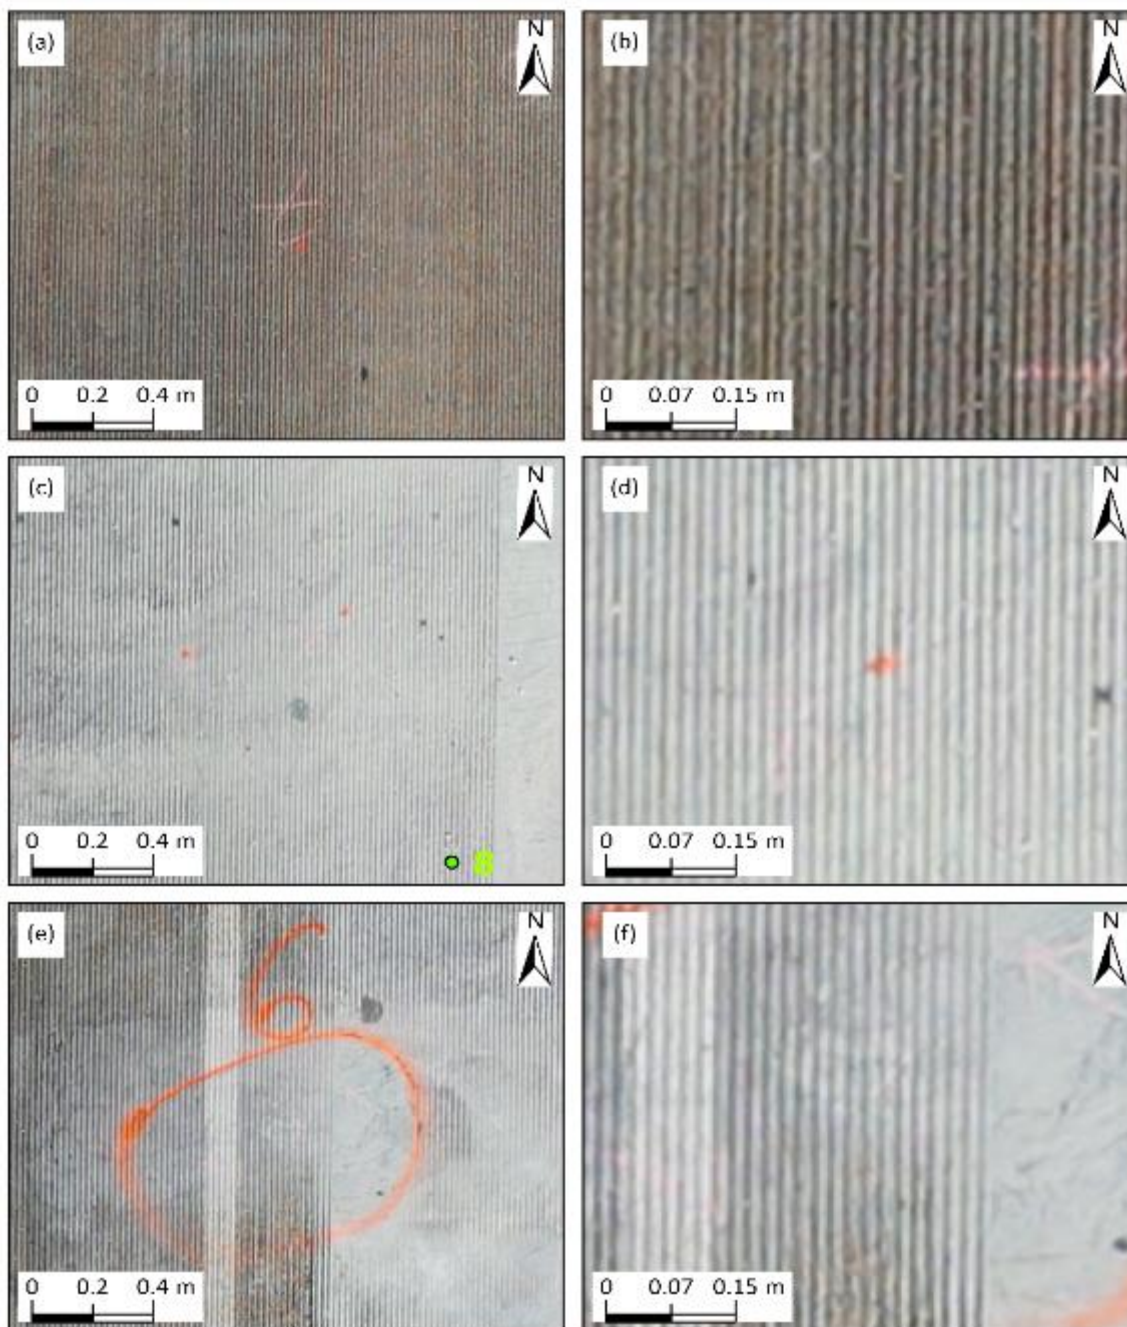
Cracks 7 through 9 at 0.079 in. (2.02 mm) GSD (1:20 zoom level on left and 1:7 zoom level on right)
